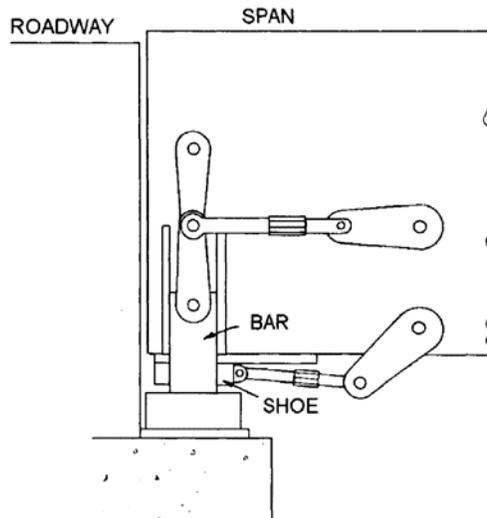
Elevating bar fully extended and shoe in place; when the bar is raised, the span will rest on the shoe
